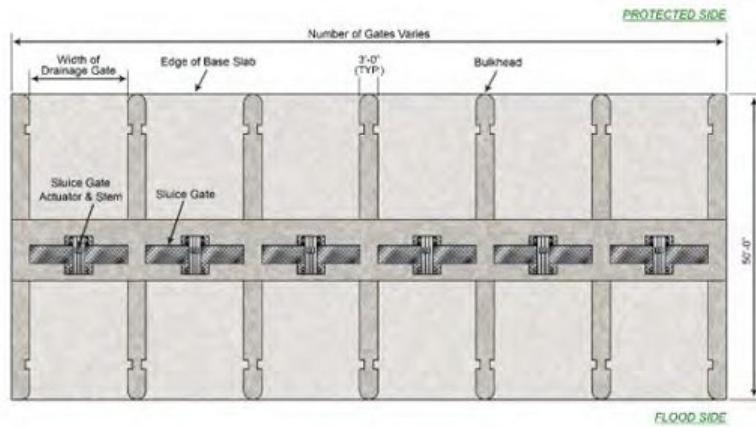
Typical Sluice Gate Control Structure (6 gates) - Plan View
